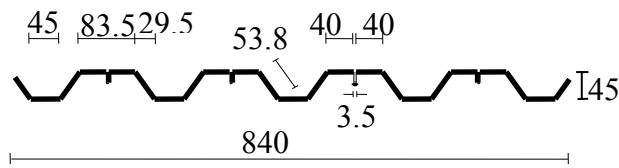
A cross-section showing Peva 45 of 1mm thickness (unit in mm)
